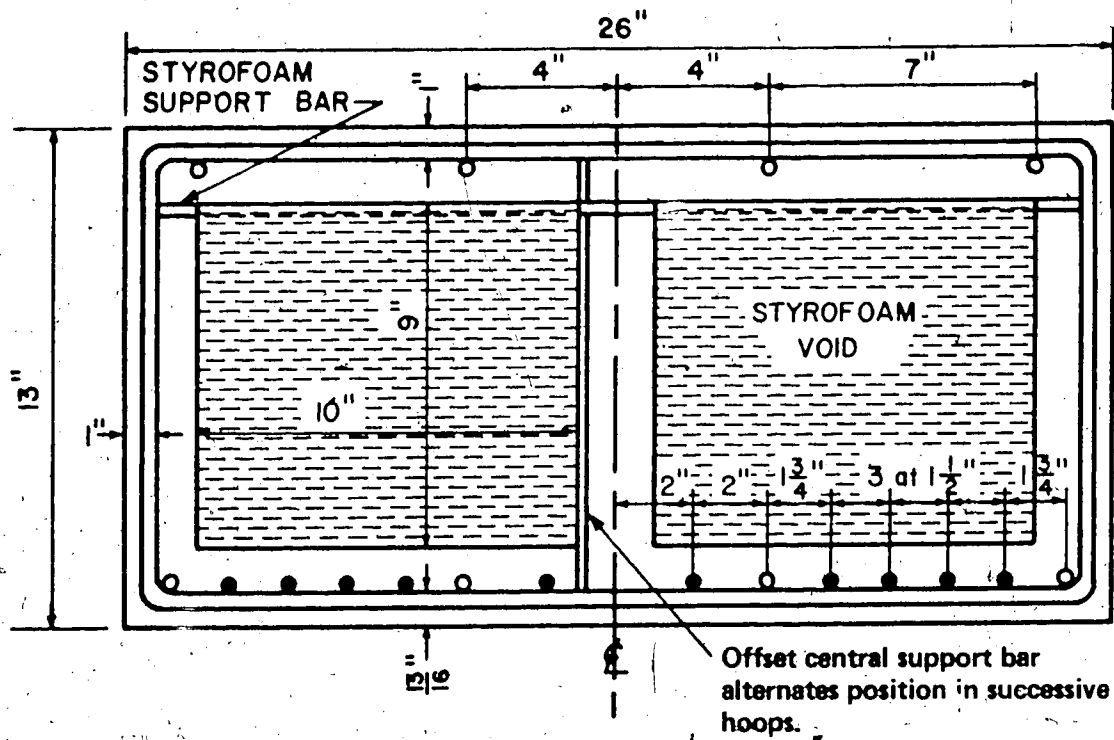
(A) RECTANGULAR BEAM CROSS-SECTION
